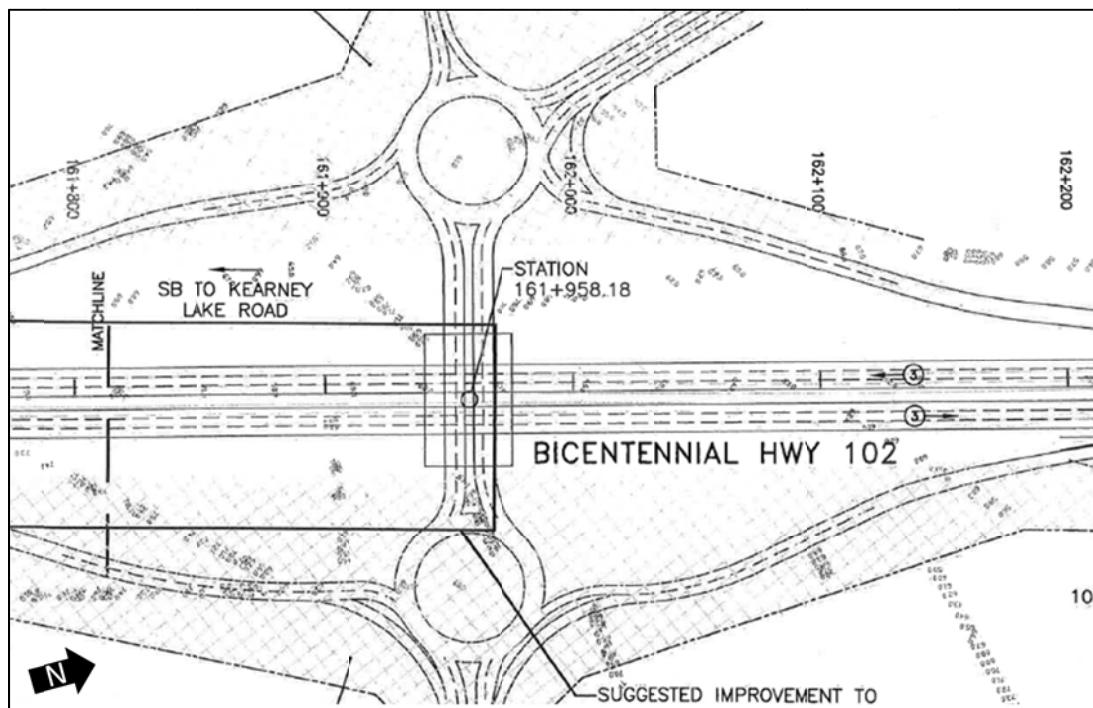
Conceptual Plan: Highway 102 at Larry Uteck Boulevard
